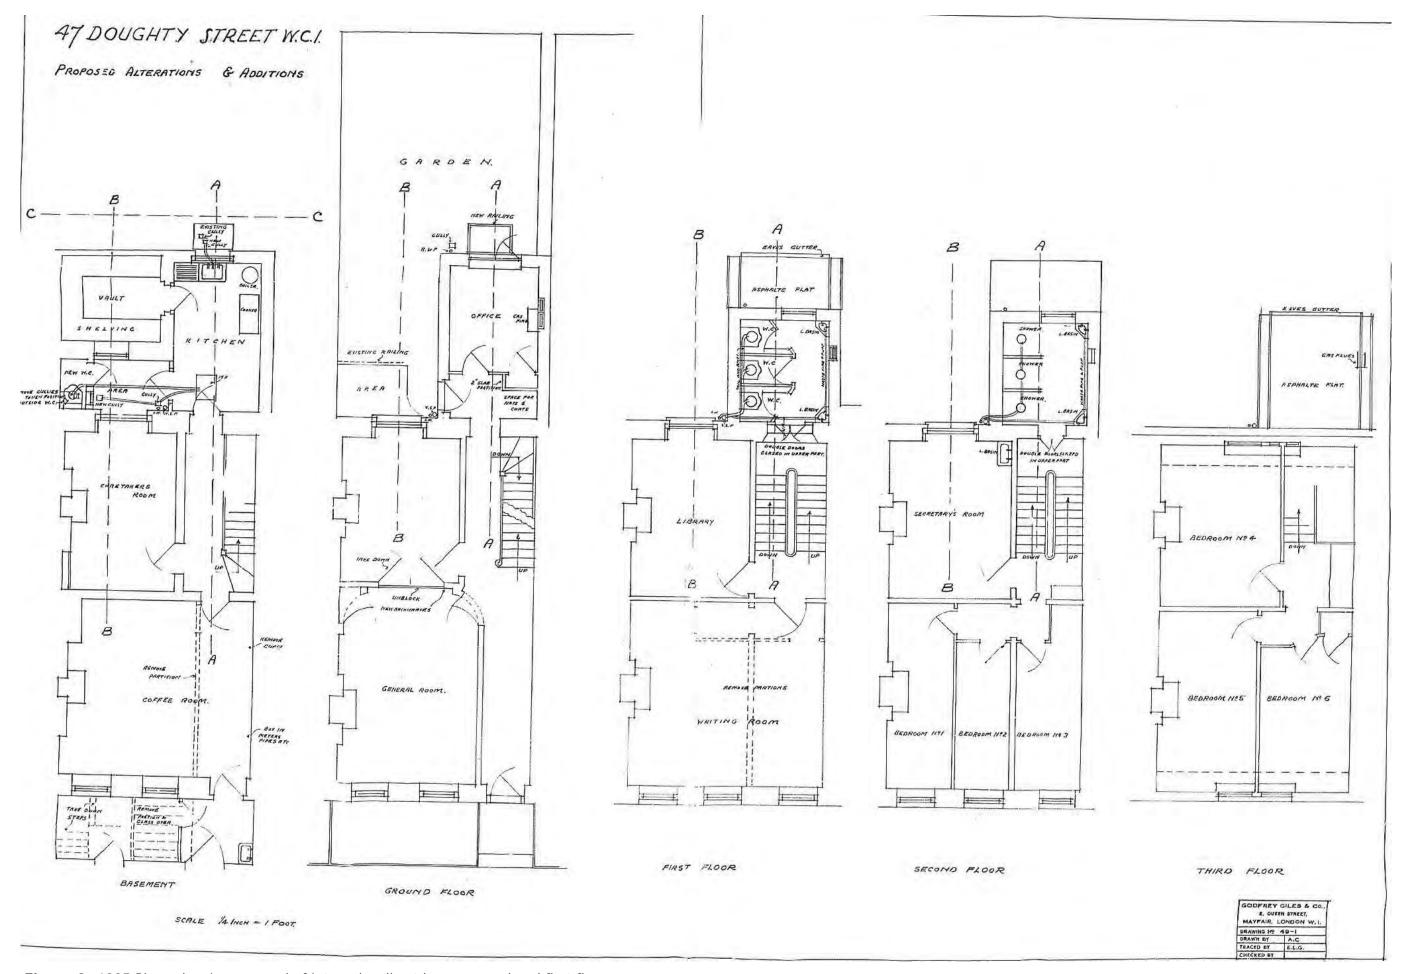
1935 Plans showing removal of internal walls at lower ground and first floor.
